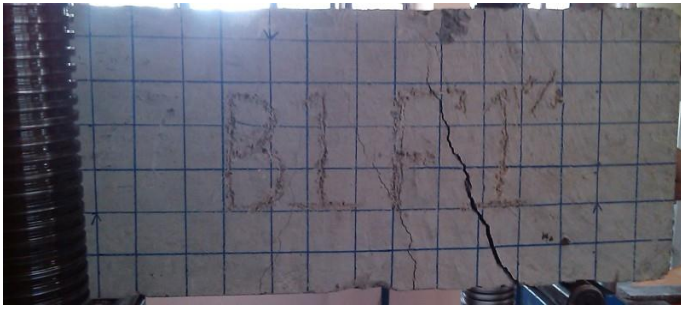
Crack Pattern of beam D30 AR50 [F1%]
